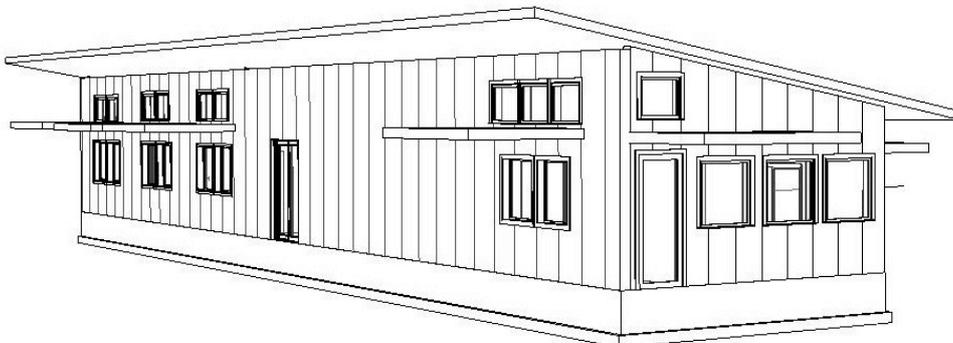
Revit 3D view of south facing wall of building
